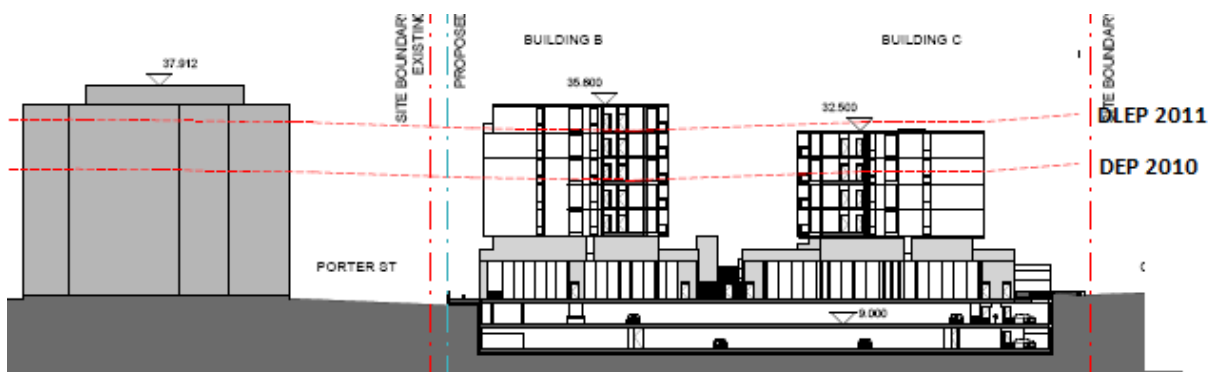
Section 3 showing Buildings B and C in comparison to the Bay One development located opposite.
